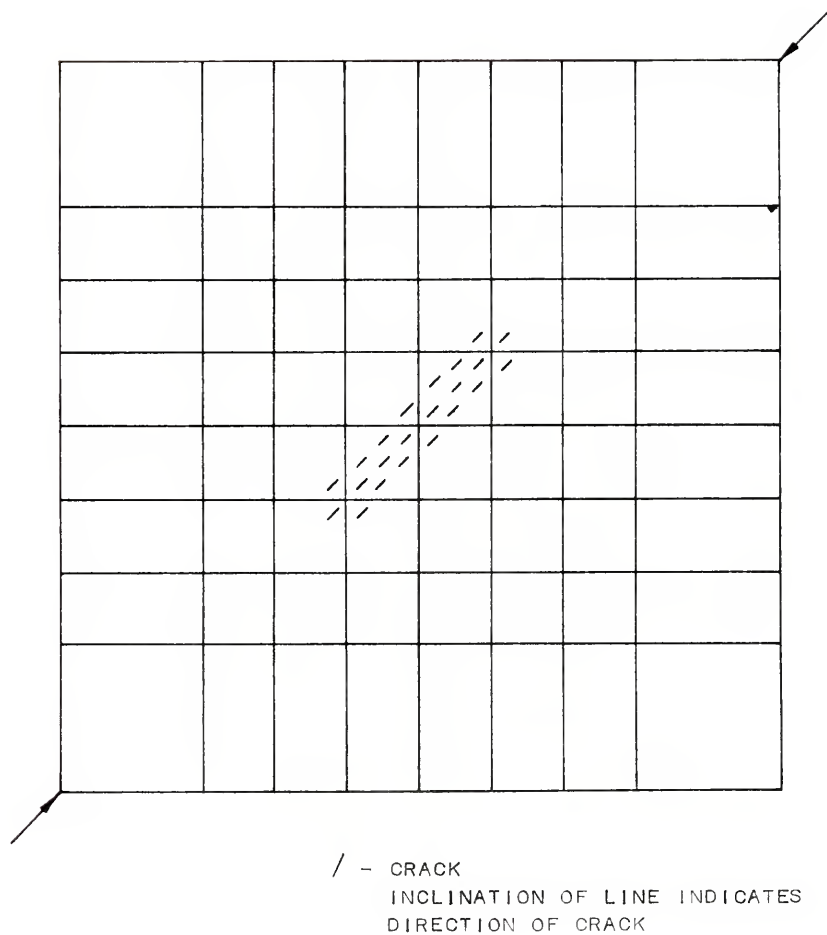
Crack pattern of square concrete panel at 198,000 lbs.
